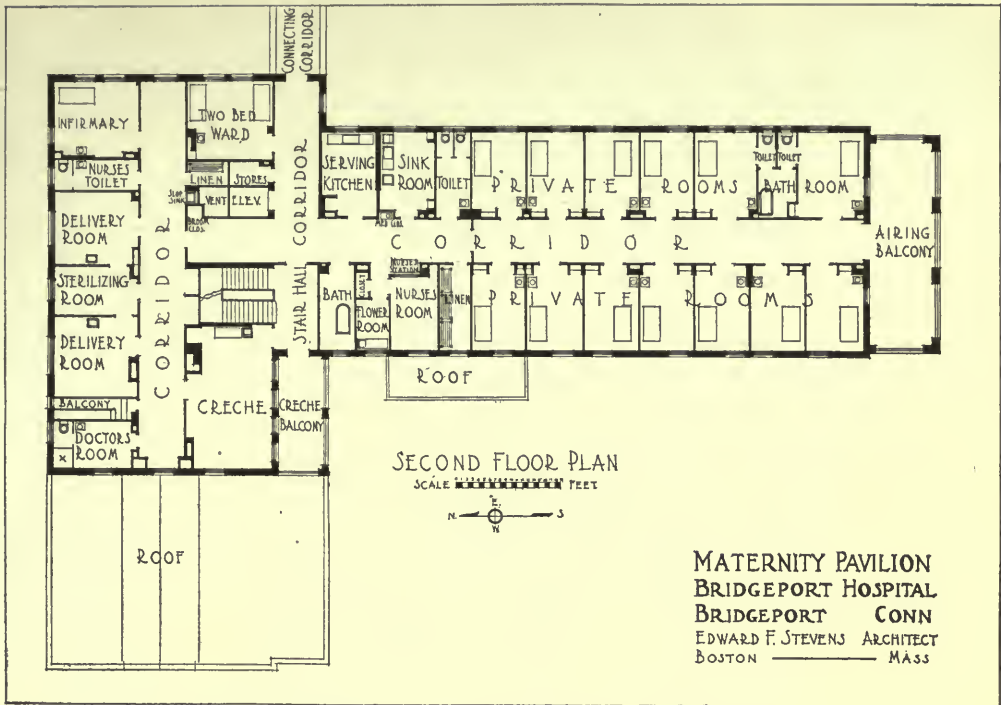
PLAN OF SECOND FLOOR—MATERNITY BUILDING, BRIDGEPORT (CONN.) HOSPITAL.
